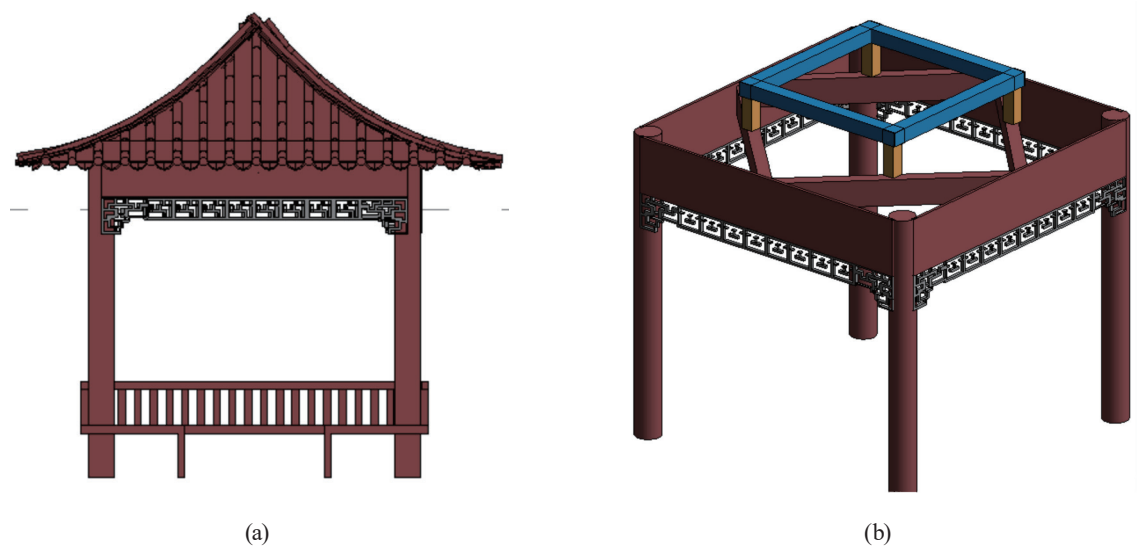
(Color online) Four-corner Pavilion: a centralized symmetrical structure with dougong. (a) Overall view. (b) Detailed timber beam-frame structures.
